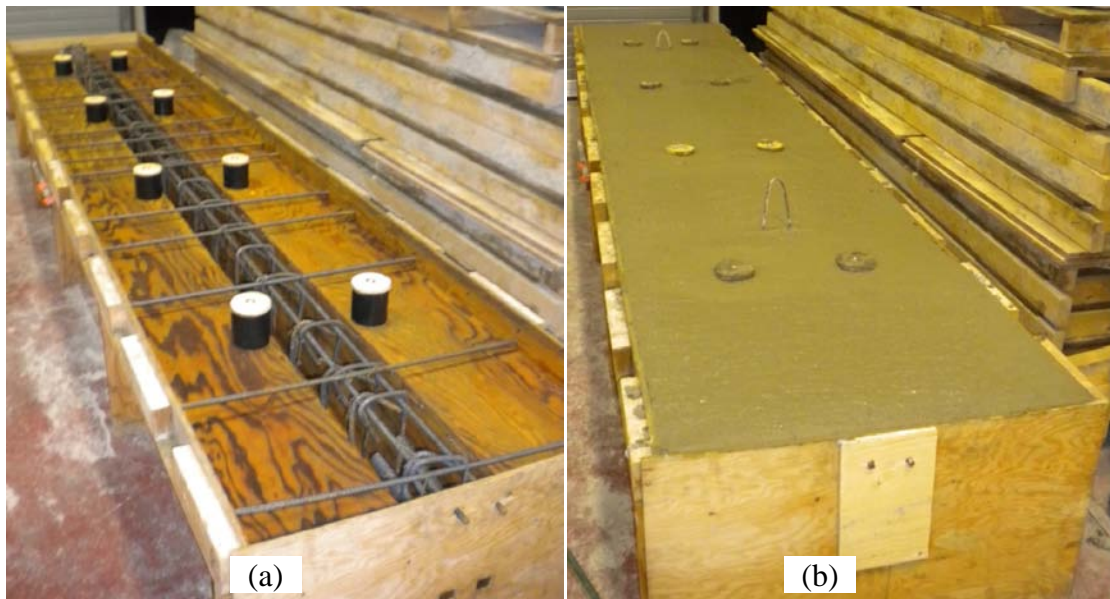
Control Specimen: (a) Reinforcement and Formwork (b) Casting.
